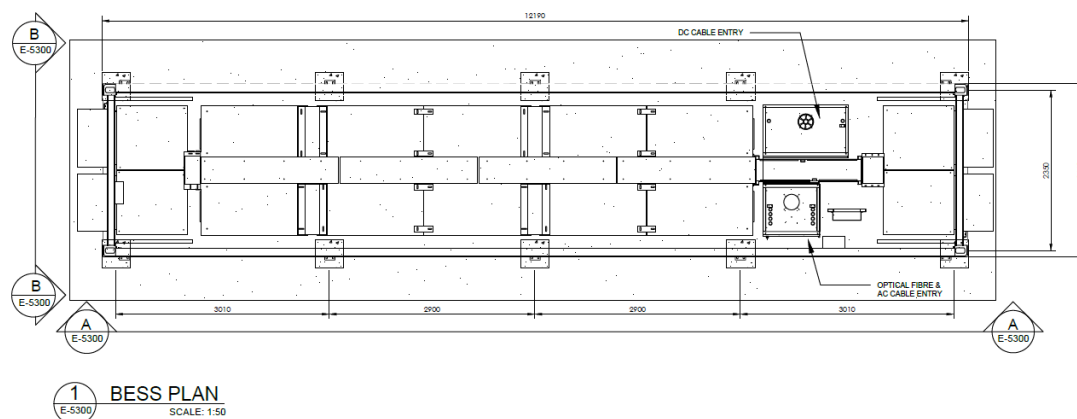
BESS Floor Plan (Source: EDP Renewables)
